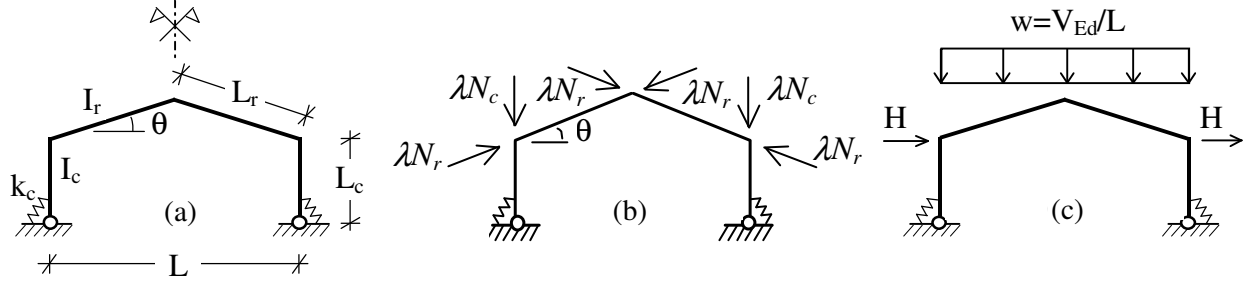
Pitched-roof frame (a) geometry, (b) stability loading and (c) in-plane loading
